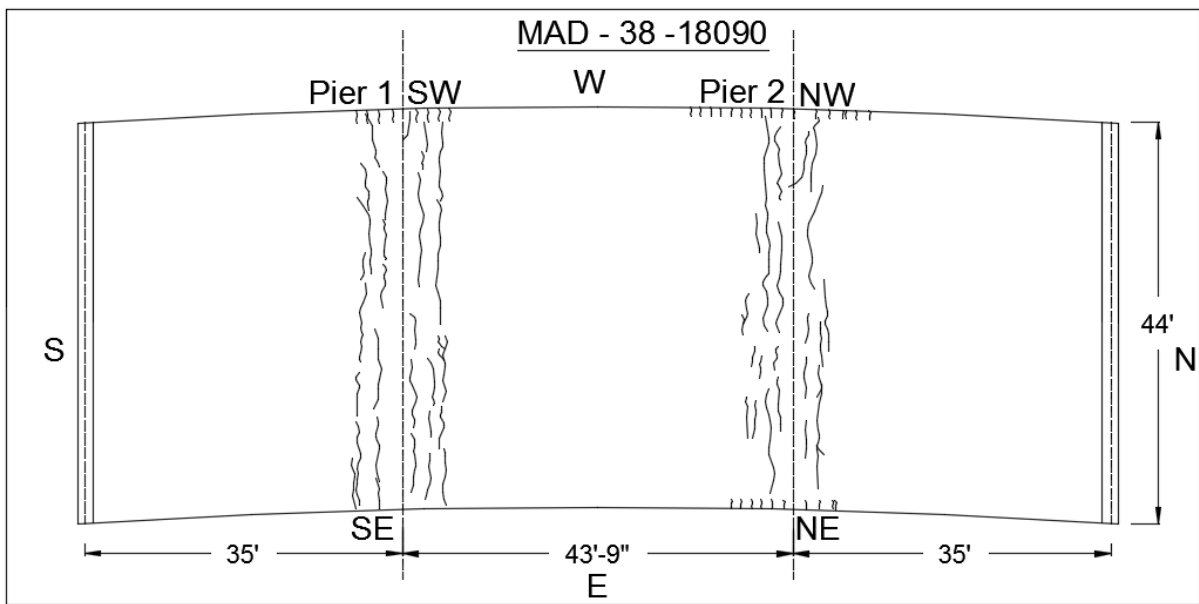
Bridge Inspection Pictures and Crack Map – MAD-38-18090
